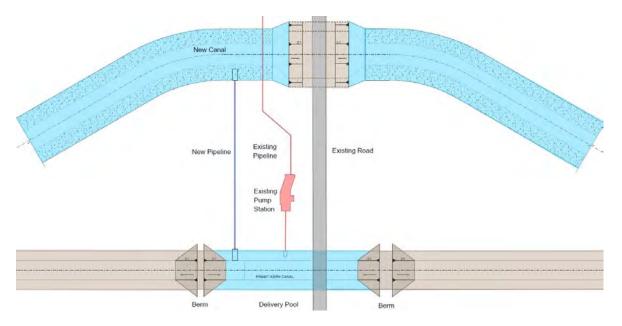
Example Pressurized System Turnout Design in the Recommended Plan
